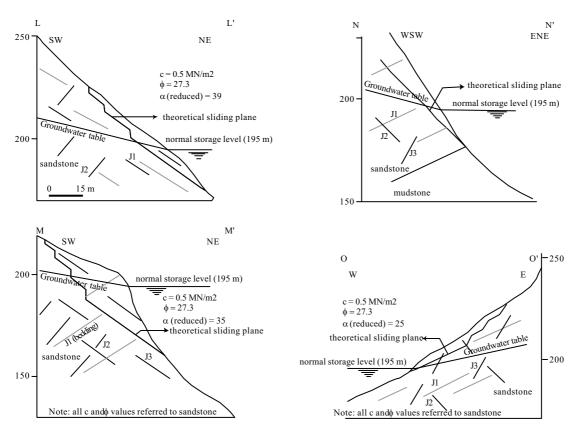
Slope stability analysis at the left and right abutments of the dam/reservoir site
